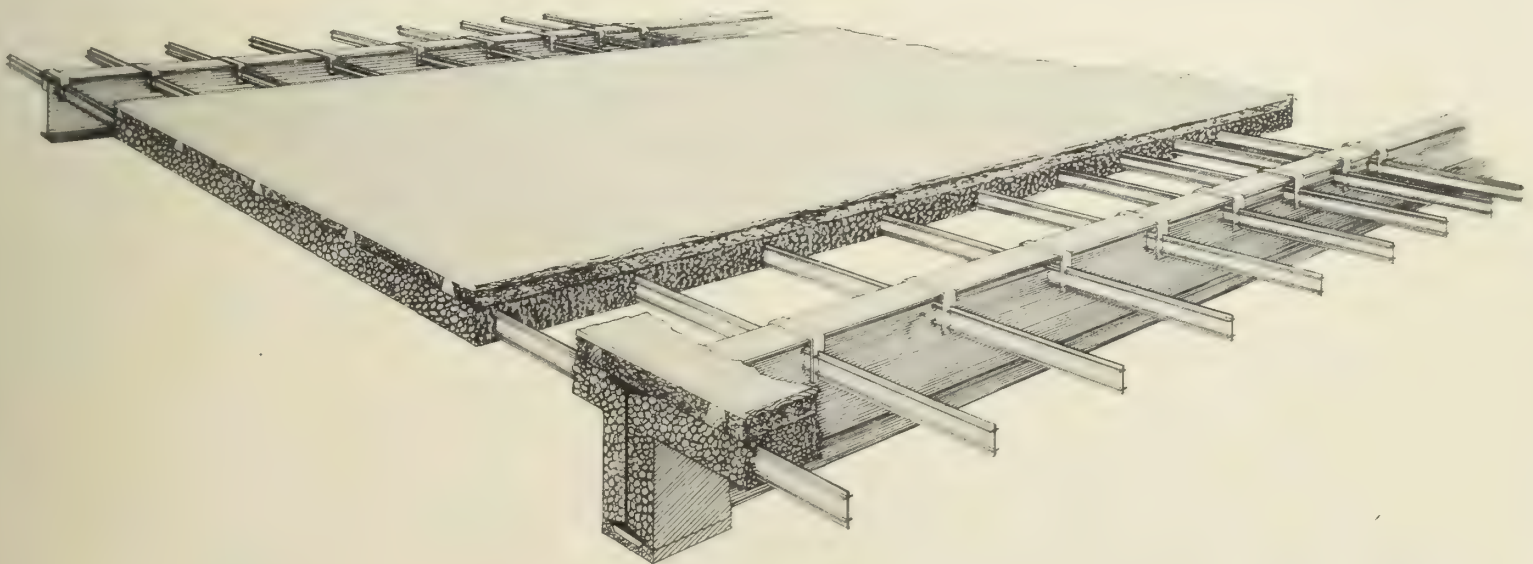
VIEW OF FLOOR WITH HEAVY BARS SUSPENDED IN STIRRUPS
